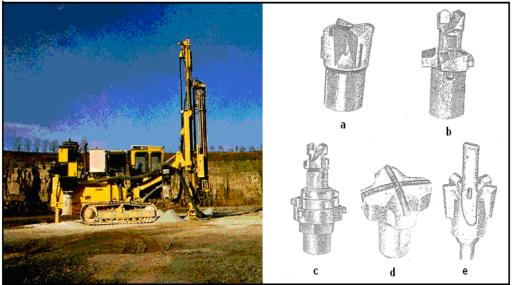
Rotary drilling rig with cutter bit with paddles a-simple cutter with Ø 75-115mm; b- compound cutter with Ø 80mm; c- compound cutter with Ø 80-145mm; d- cross roller-bit with Ø 120mm; e- compound cutter with Ø 100mm.
